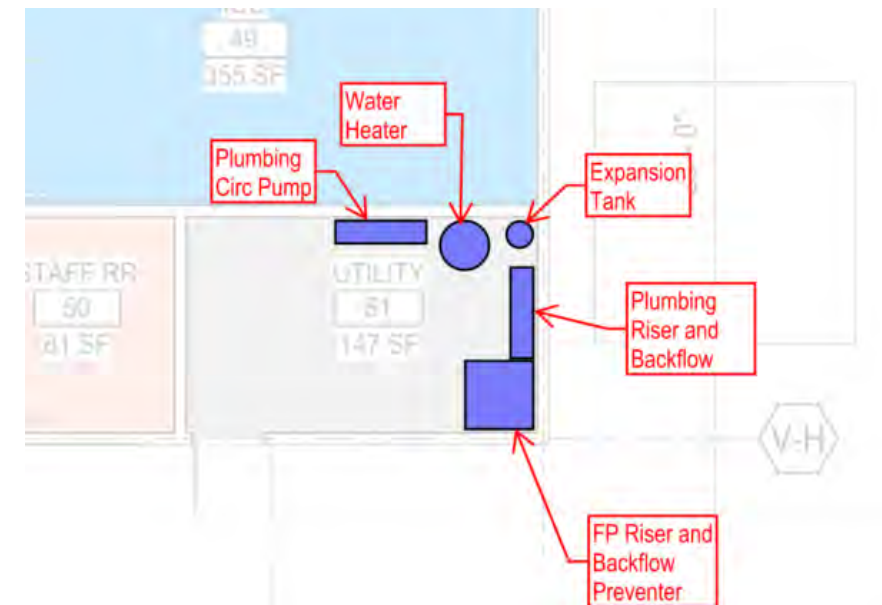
ANIMAL CARE BUILDING PLUMBING EQUIPMENT
